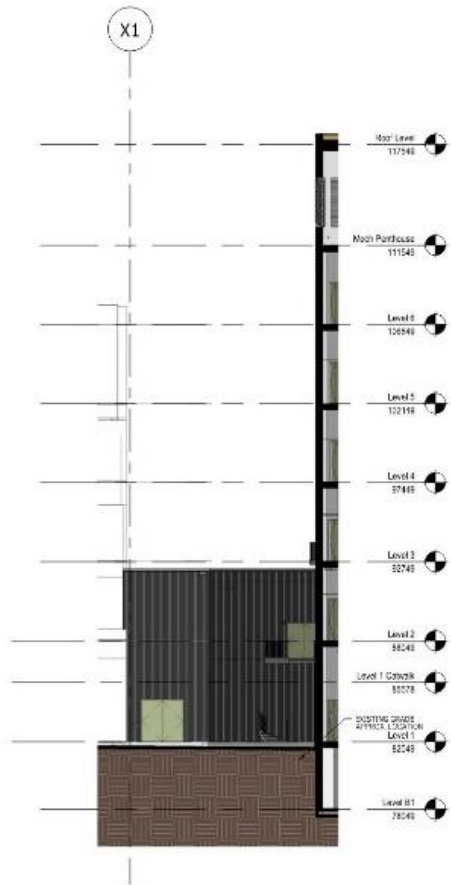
Proposed Building Elevations (Loading Docks) - 451 Smyth Road (Prepared by Parkin Architects Limited, dated April 18, 2024)
